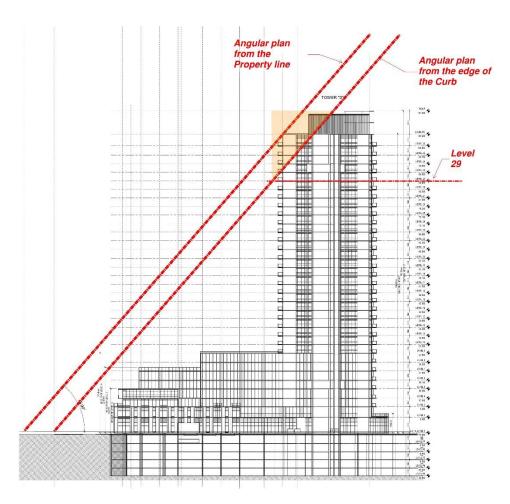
Section through lot 2, Towers DF, refer to RZ-19 for Section Details
